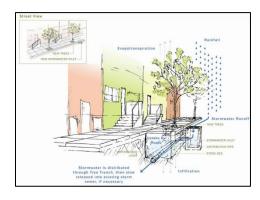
Continuous soil trenches under the sidewalk provide soil for trees and space for amenities.
